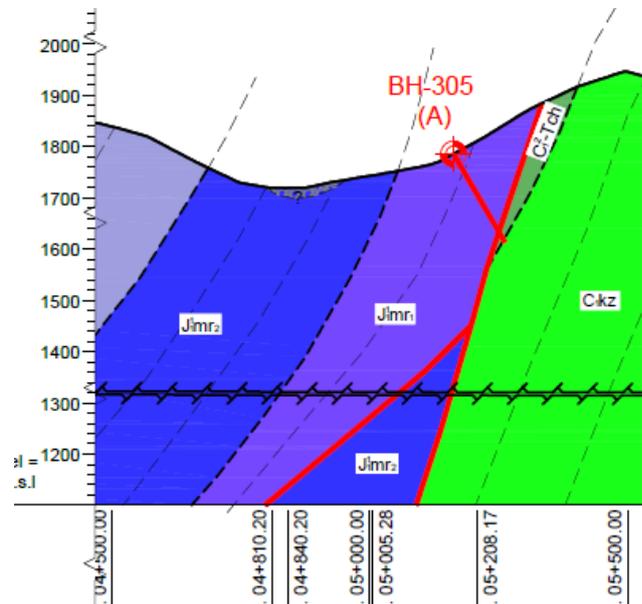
Section of the geological profile (L-6768-B-GL-HR-GE-DW-002_002, 15.12.16)
